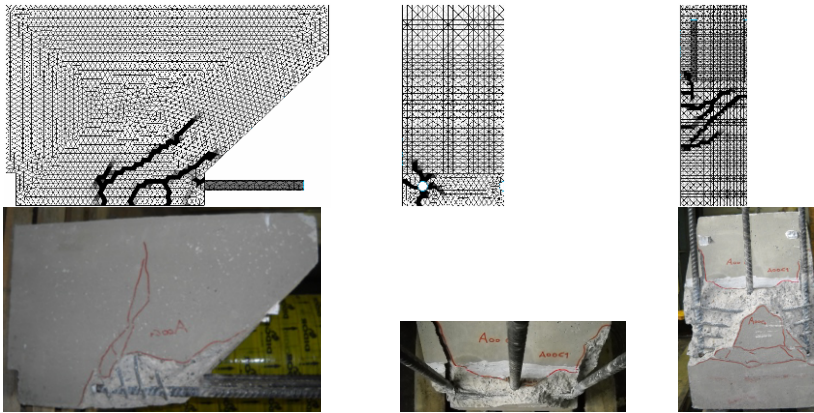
Crack pattern: reference specimen Type A, corner bar test
